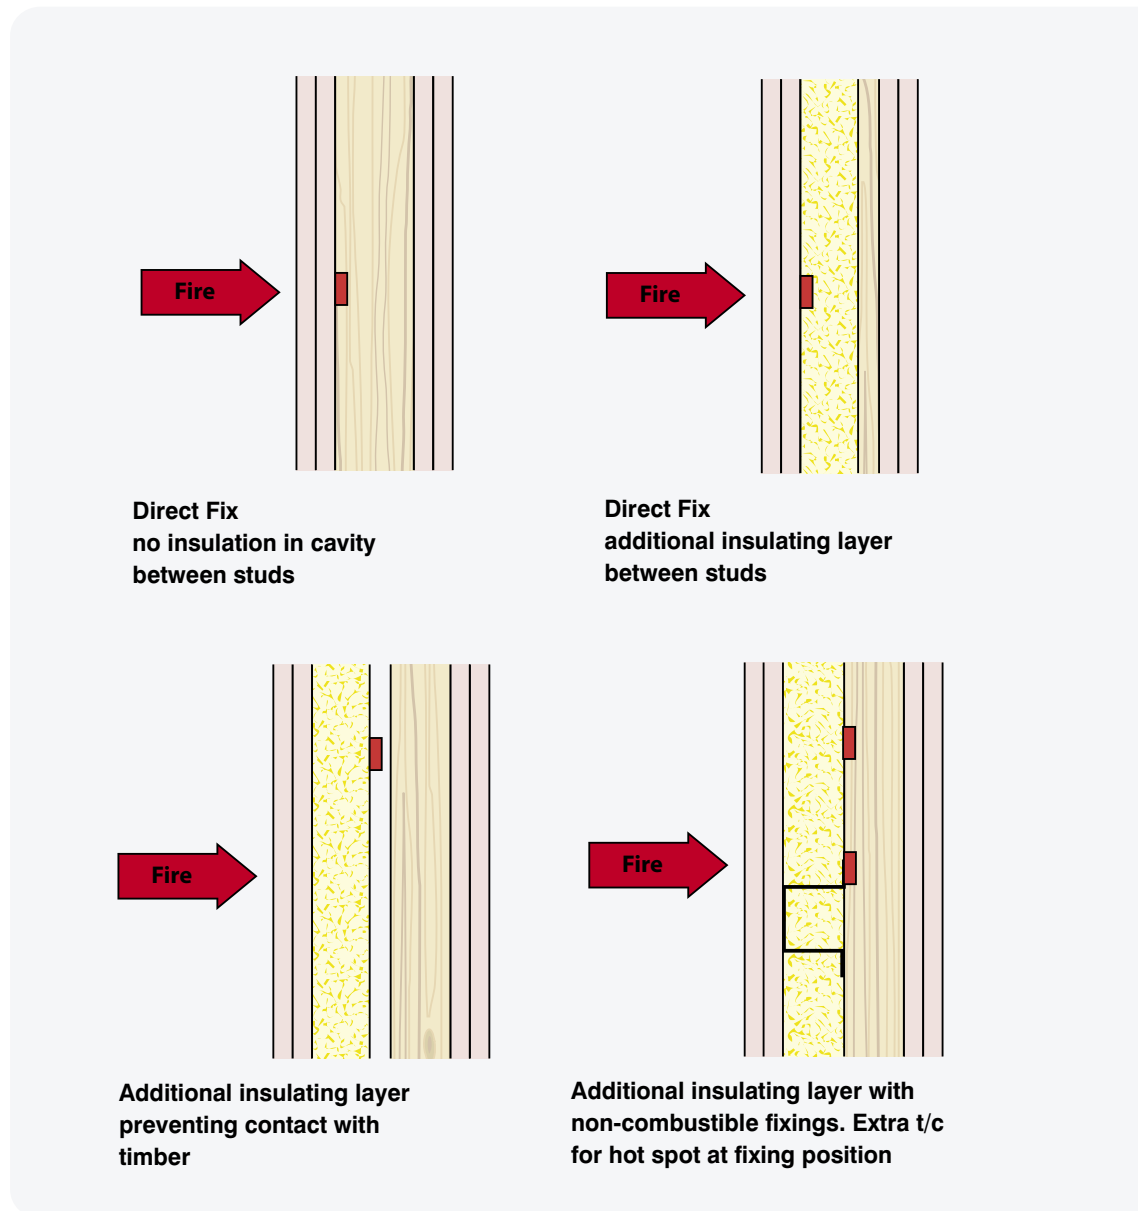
RISF thermocouple positions for typical timber-frame specimen configurations.
